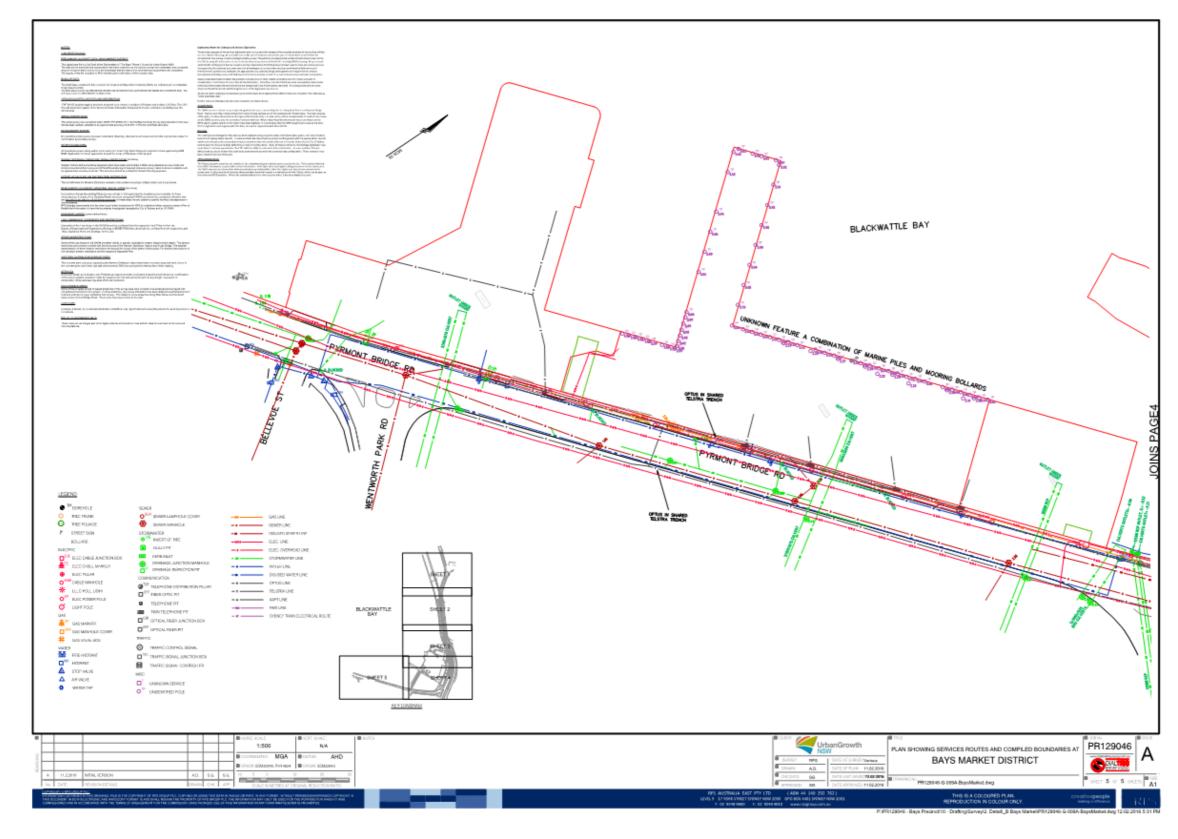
Existing Service adjacent Pyrmont Bridge Road
